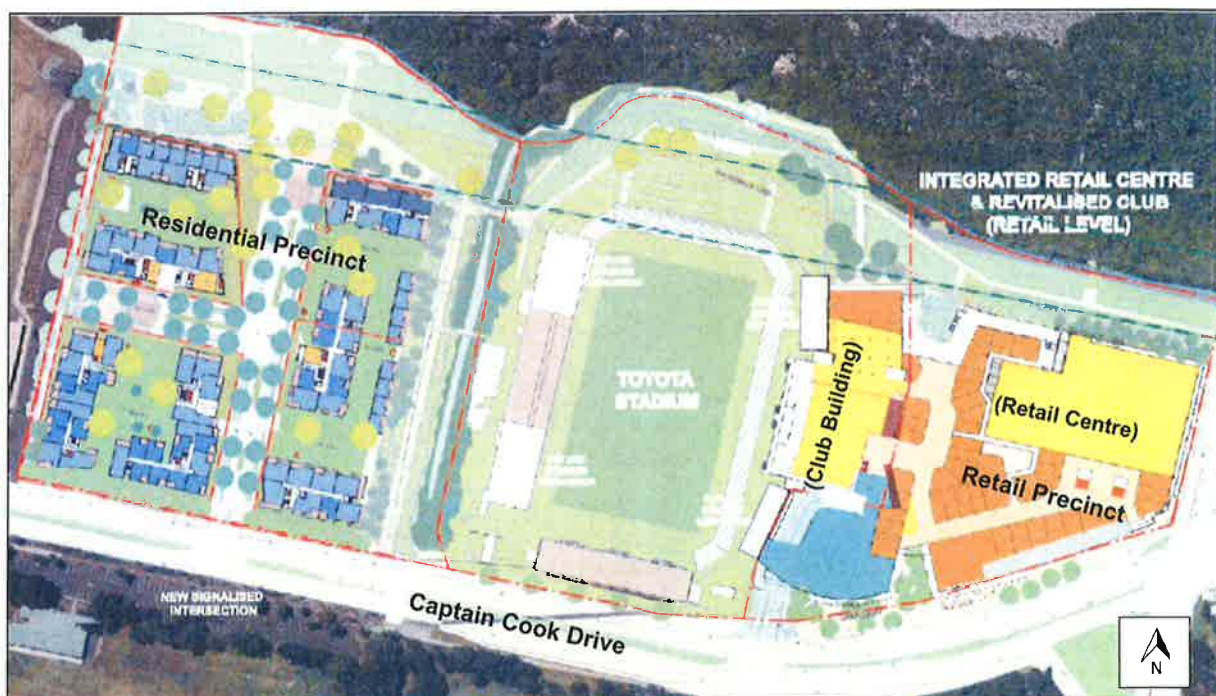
Approved Concept Plan and Stage 1 Site Layout
